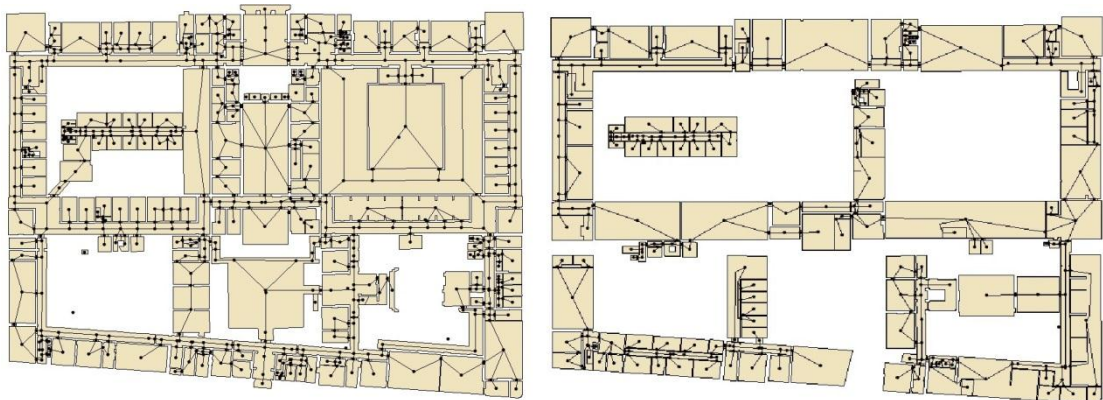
Floor plan of the ground and first floor of the “Plateau-Rozier” building with network visualization
